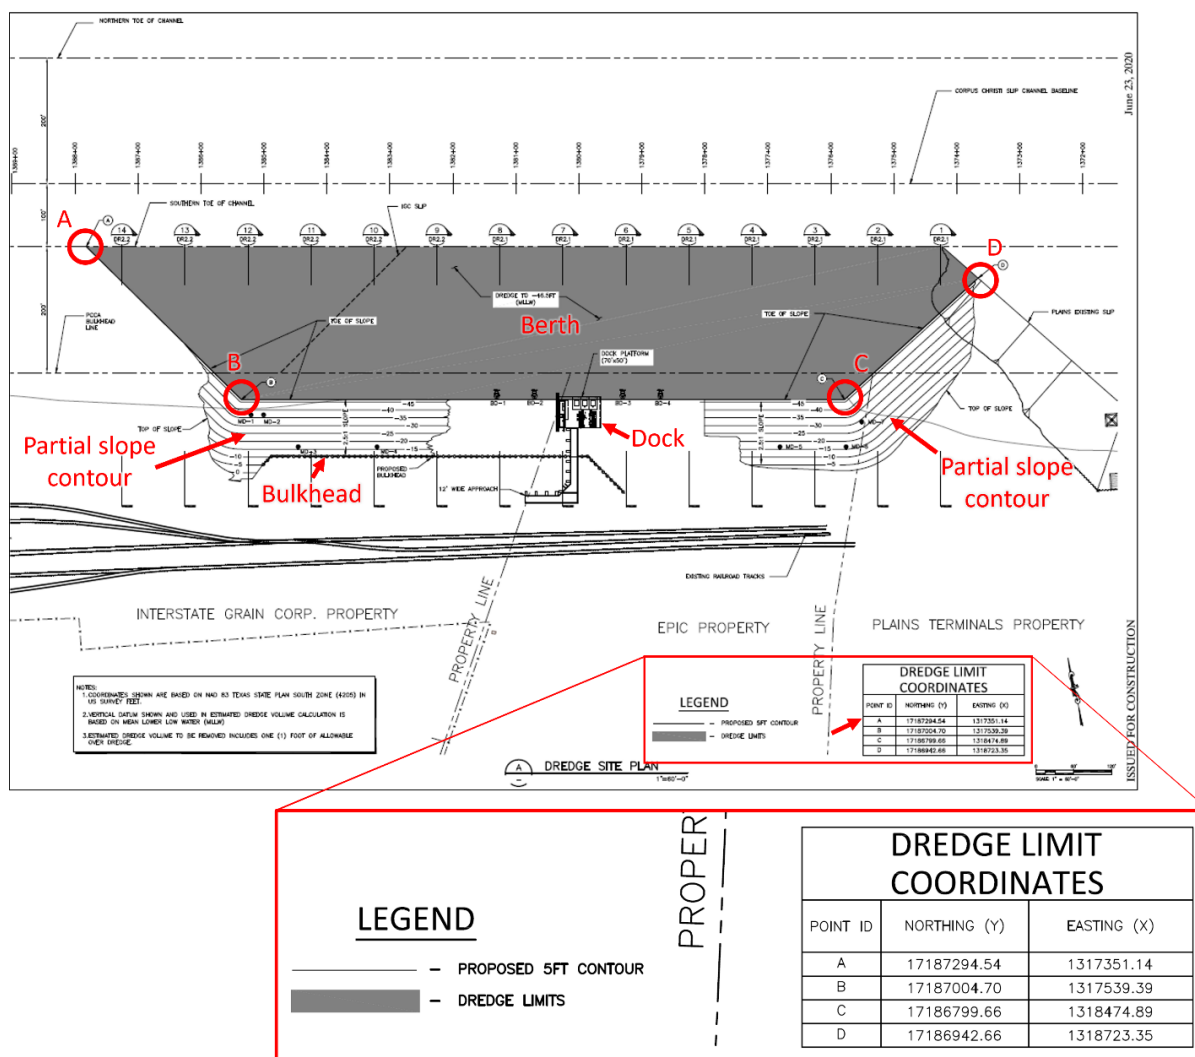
Annotated “Dredge Site Plan,” drawing no. DR 1.1, with exploded view of legend and coordinates table, from EPIC Marine Terminal dredging construction plan. Pipelines are not shown in the drawing. (Source: Orion Marine Group, annotated by NTSB)
